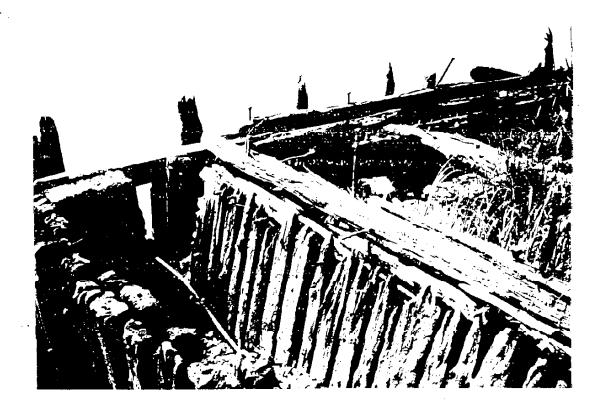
Outshore ("T") End of pier, from downriver, showing notched timber construction.
